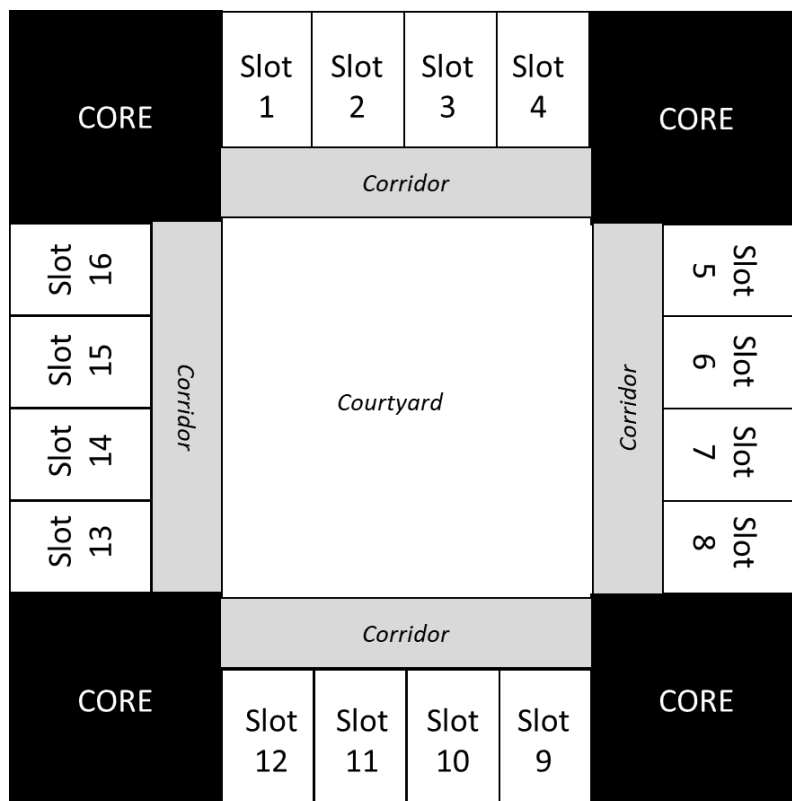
Floor plan of building (slot numbers shown are those for Floor 1).
